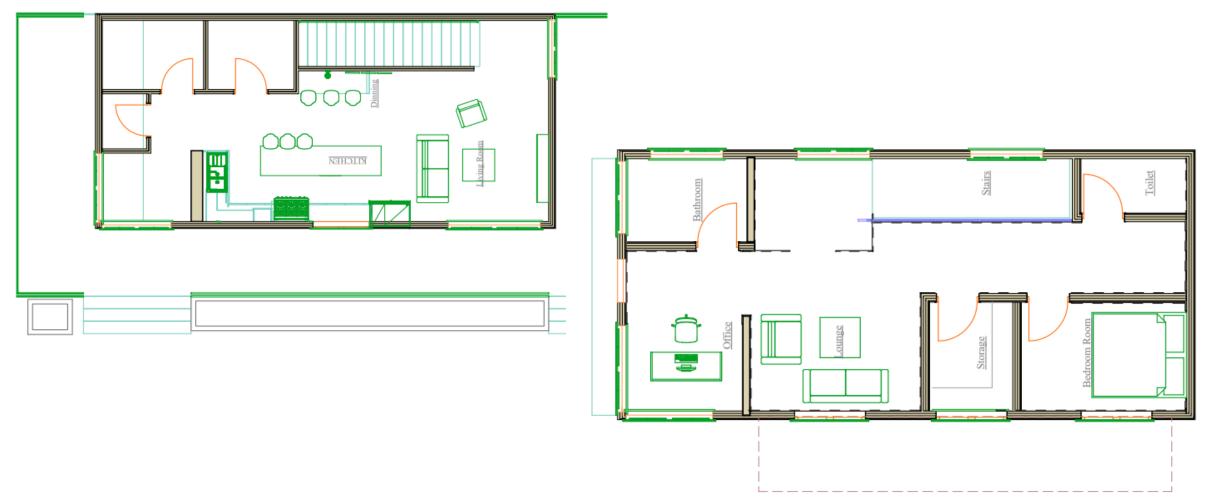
and 42. Complete Floor Plan of both levels including furniture
